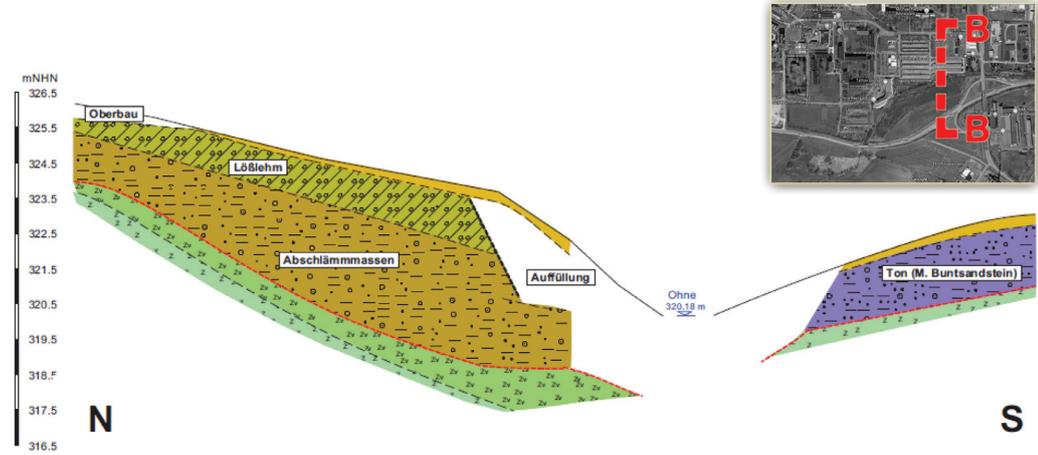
Section B-B of the subsoil layer structure²⁹⁹
